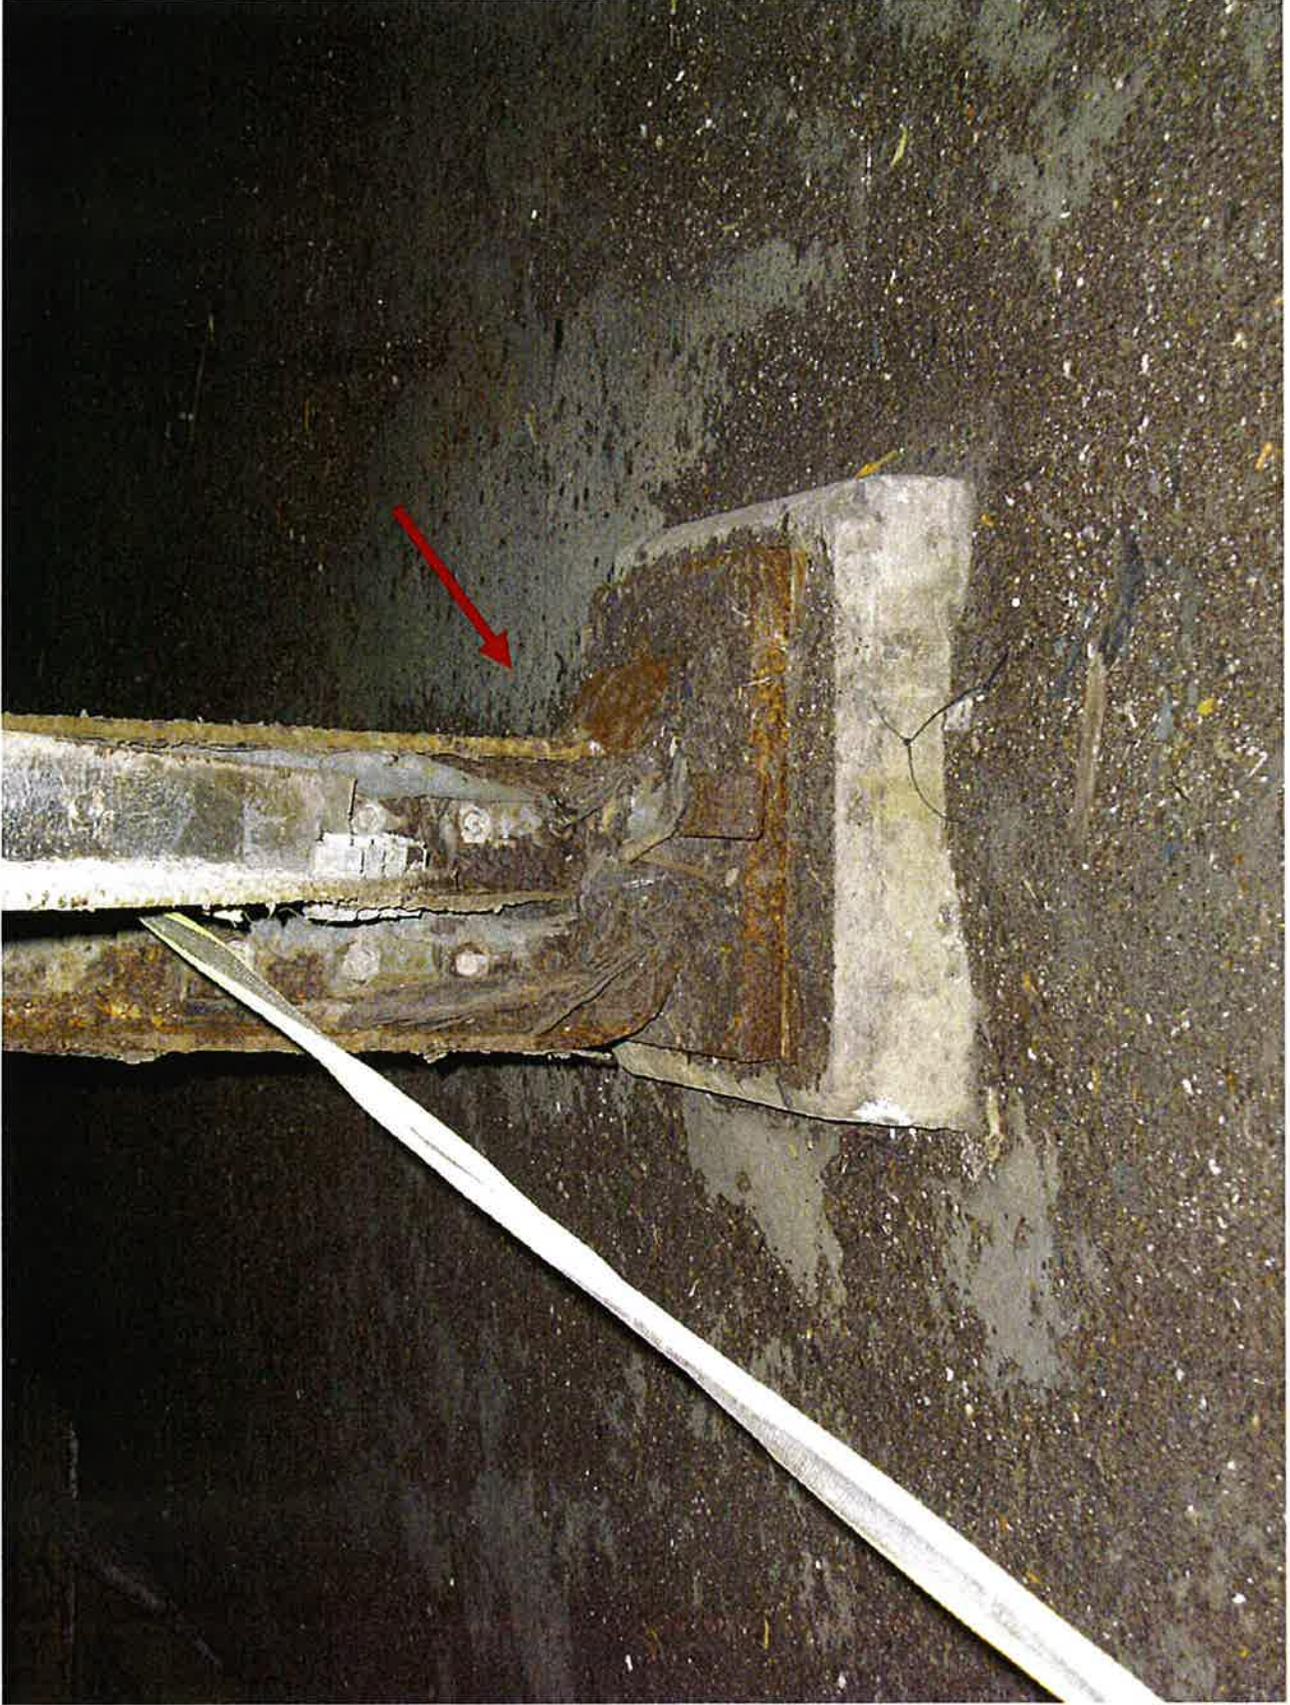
FAILED COLUMN AT FIRST INTERIOR BAY, LOOKING NORTH, WEST HALF OF BUILDING 2
